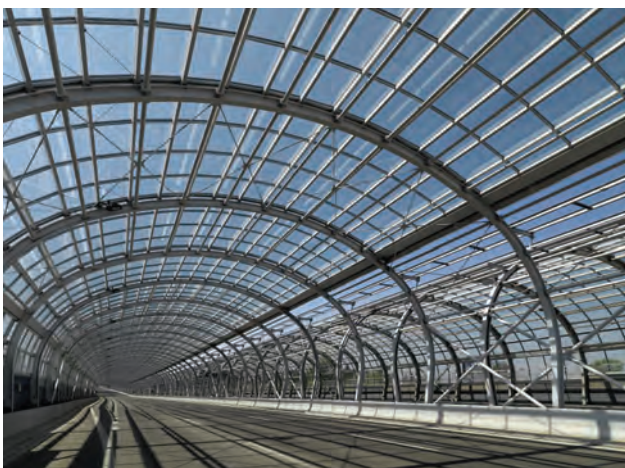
Structure and filling of the half-tunnel noise barriers [14]
